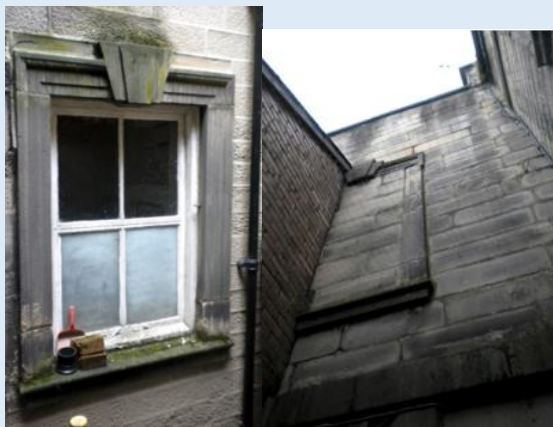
North elevation, ground and first floor windows (C. Stansfield)
